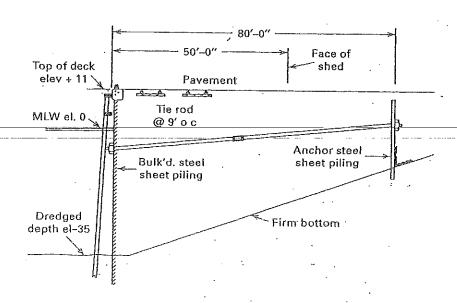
Solid fill type of wharf construction. (Courtesy The American Association of Port Authorities.)
